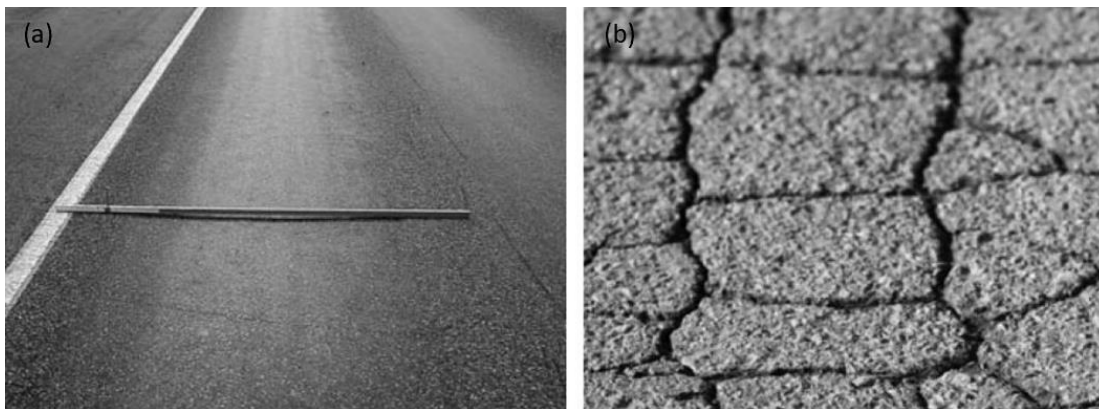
Premature failure in asphalt pavements: a) rutting and b) fatigue cracking [2]
